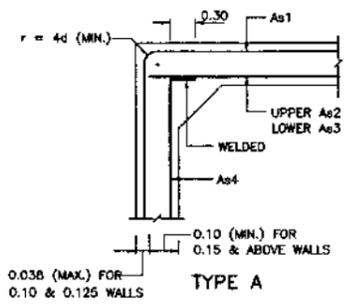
DETAILS FOR SKEW θ CAST-IN-SITU BOX
